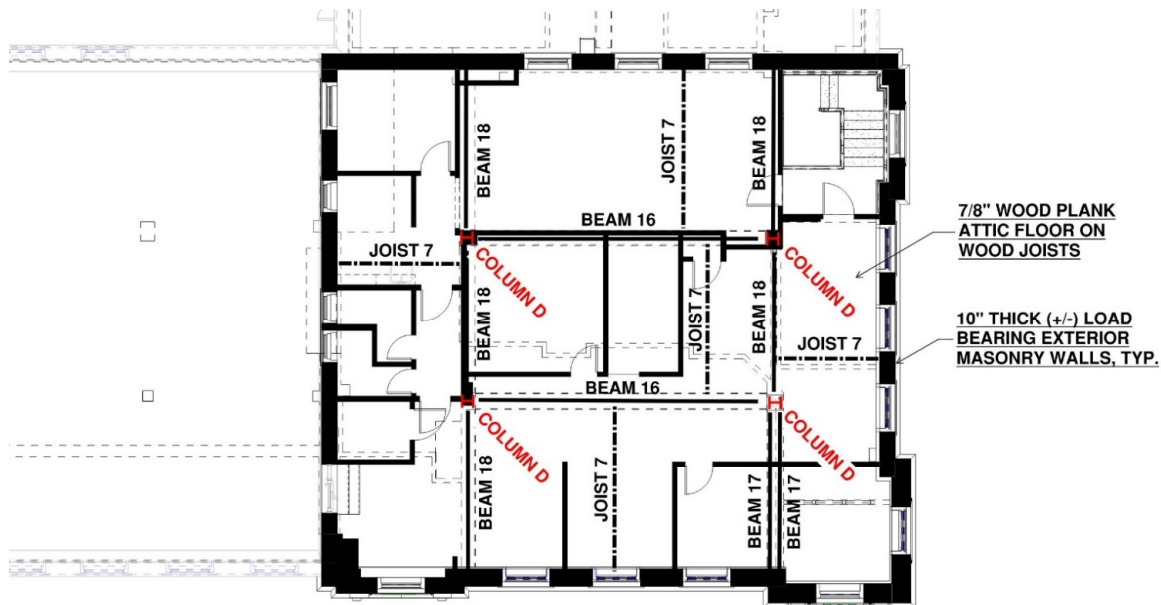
A: Upper Roof Framing Plan. Structural elements shown in red require reinforcement, see Figure 2B.
